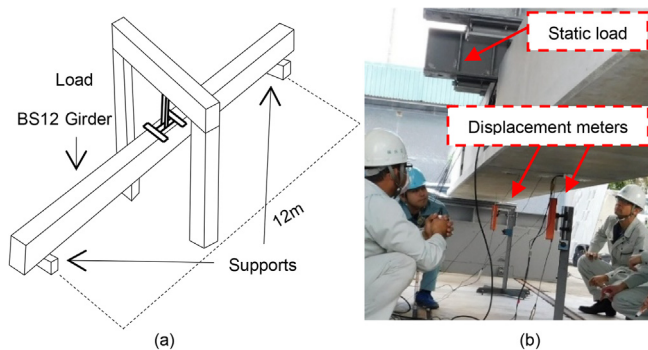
(a) Bending test schematic; (b) Positions of displacement meters.
